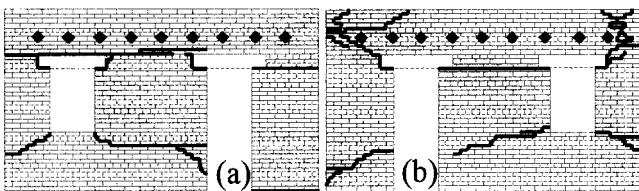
Crack pattern after La Malbaie $\times 2.0$ (a) west wall and (b) east wall
